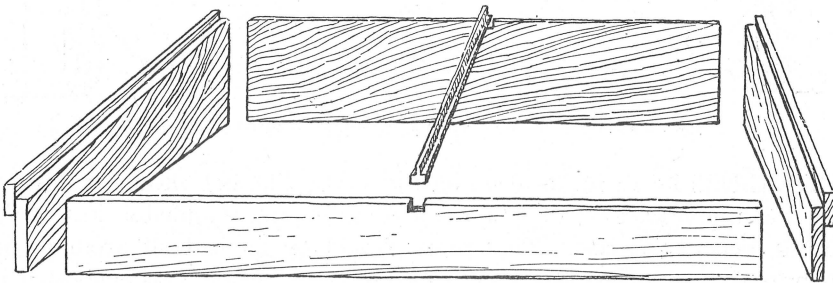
A TWO-SASH COLDFRAME SHOWING DETAILS OF CONSTRUCTION
